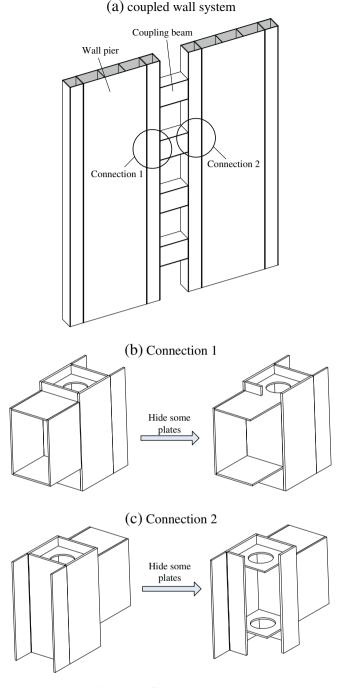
Details of the concrete filled steel plate composite coupled wall.
